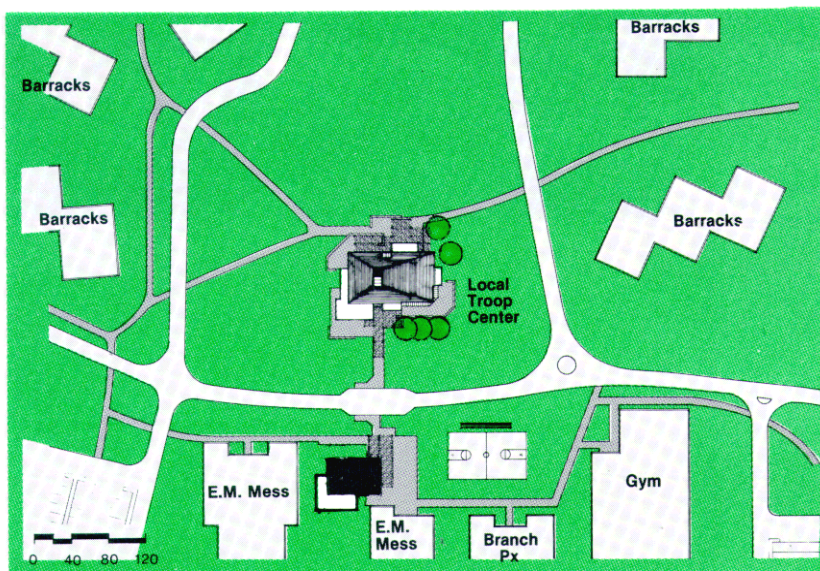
7 Fort Plains: Local Troop Center- Site Plan
